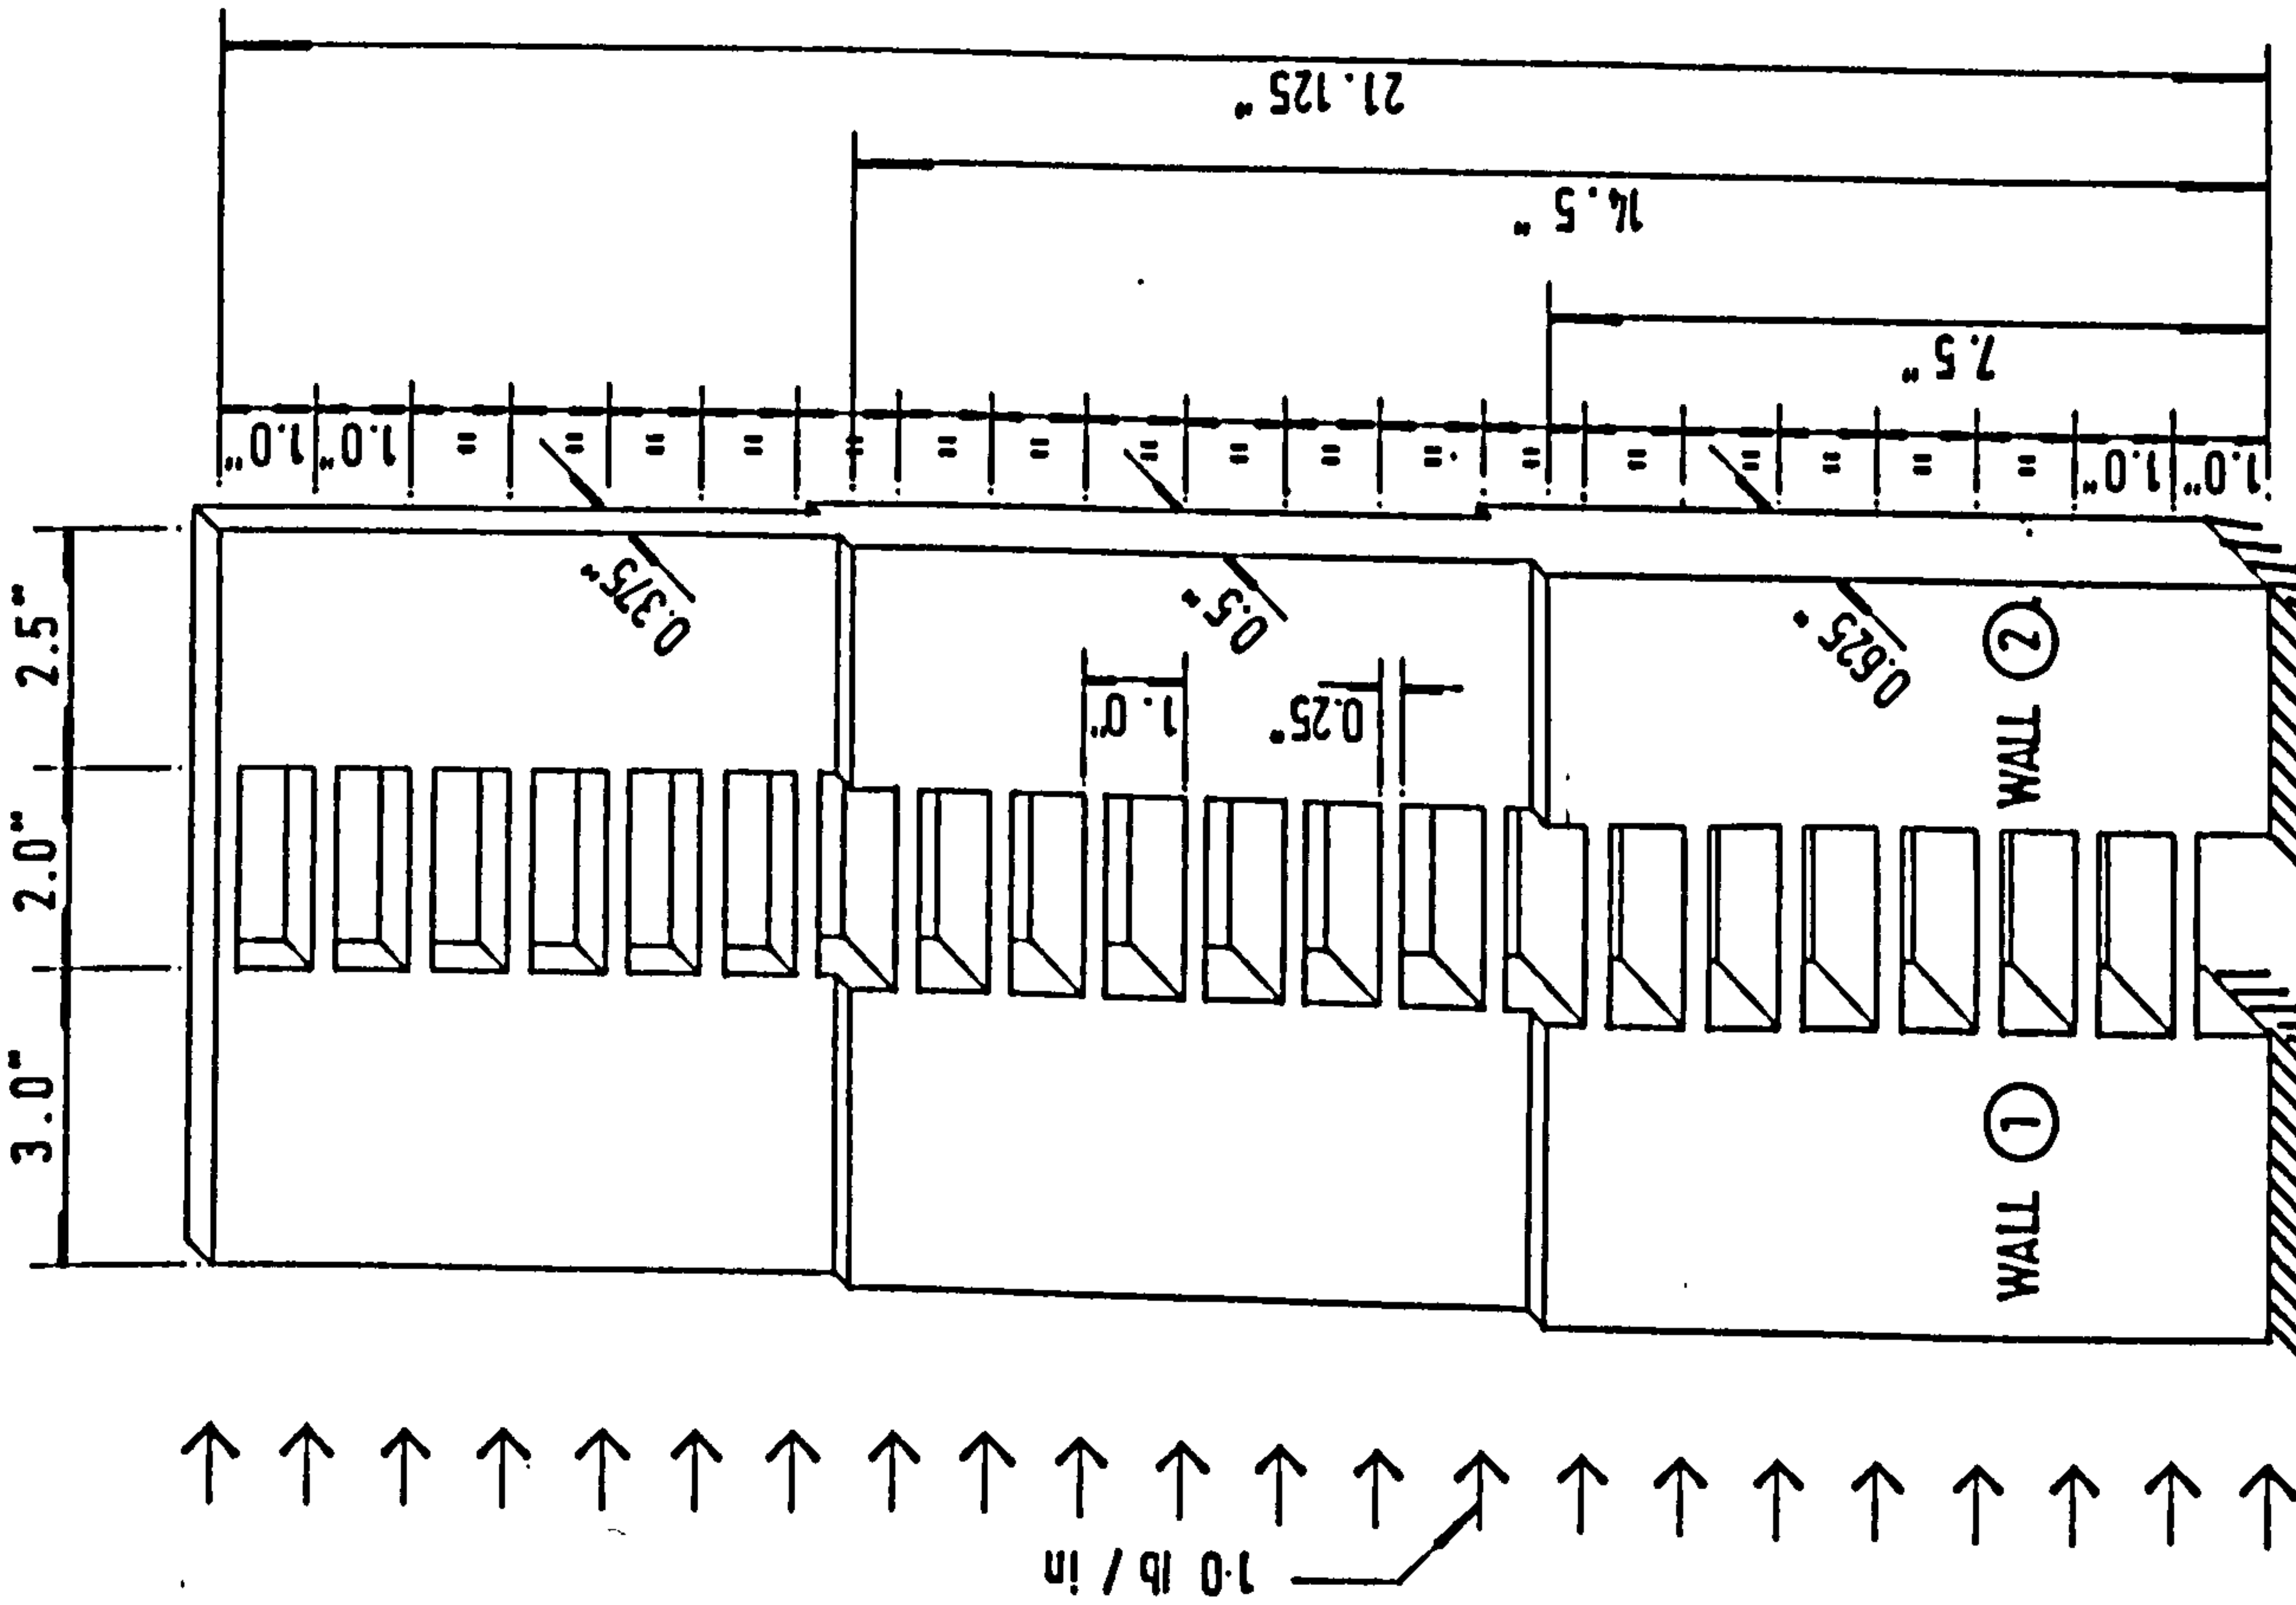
COUPLED SHEAR WALL MODEL (7)
